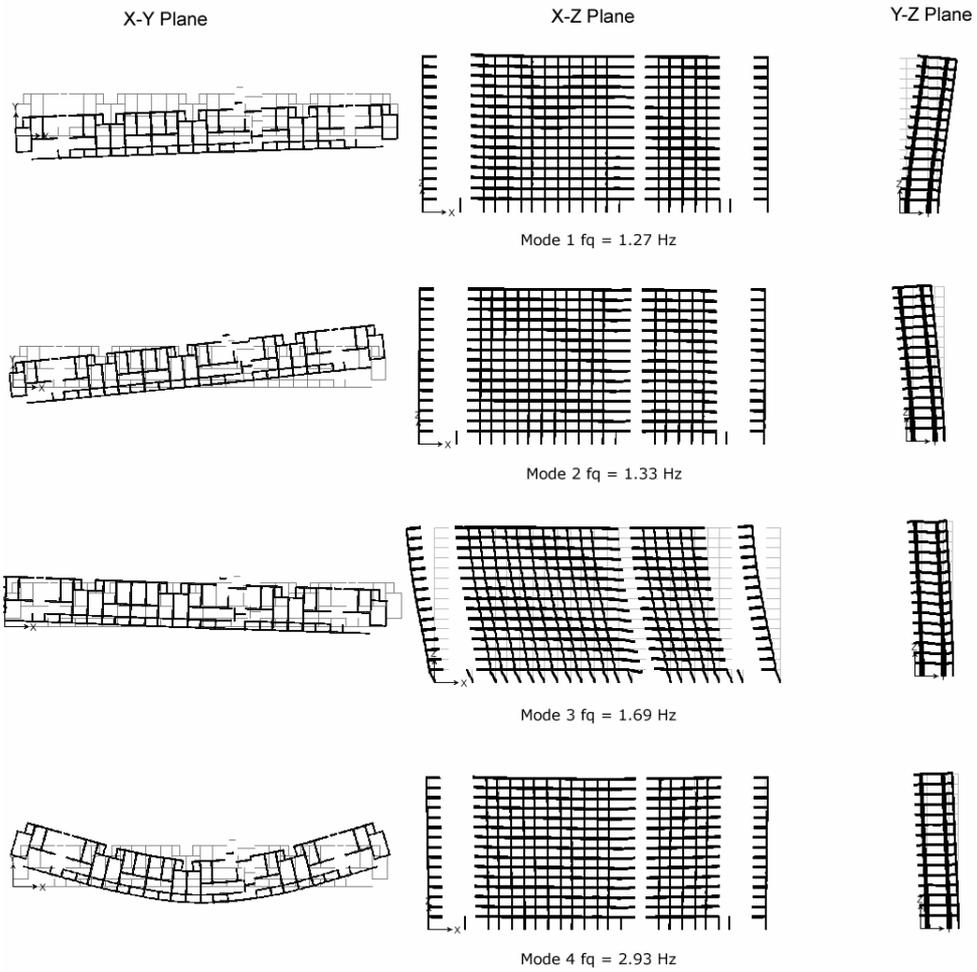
First four mode shapes of the frame model with brick walls and flexible diaphragms
